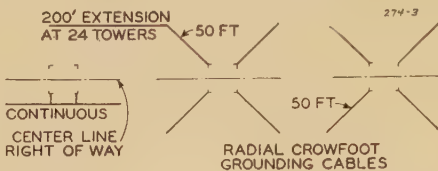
Plan of various tower-footing-grounding cable designs used on Wallenpaupack-Siegfried line. For diverting cables see Figure 4
